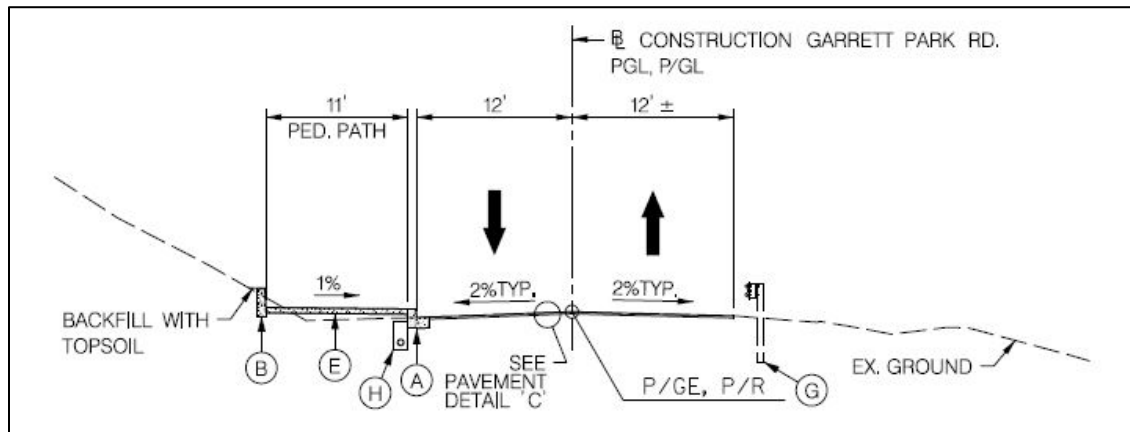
Proposed Typical Cross Section – Stations 10+61 to 11+58
